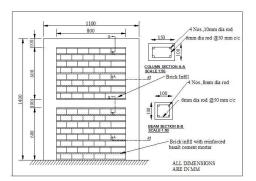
Geometry details of infilled RC frame with reinforced basalt cement mortar
